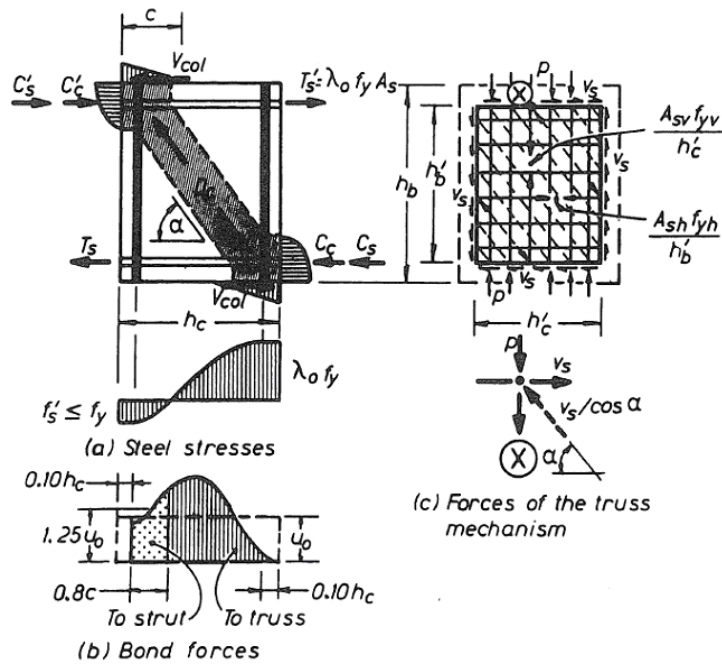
Concrete strut and truss joint shear mechanisms in conventional reinforced concrete beams (Paulay & Priestley, 1992)
